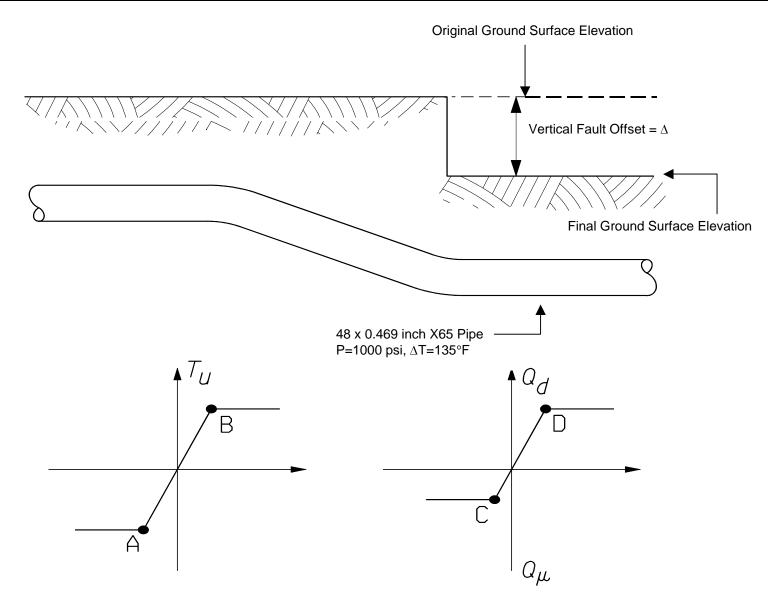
Buried Pipeline Subject to Vertical Fault Movement
